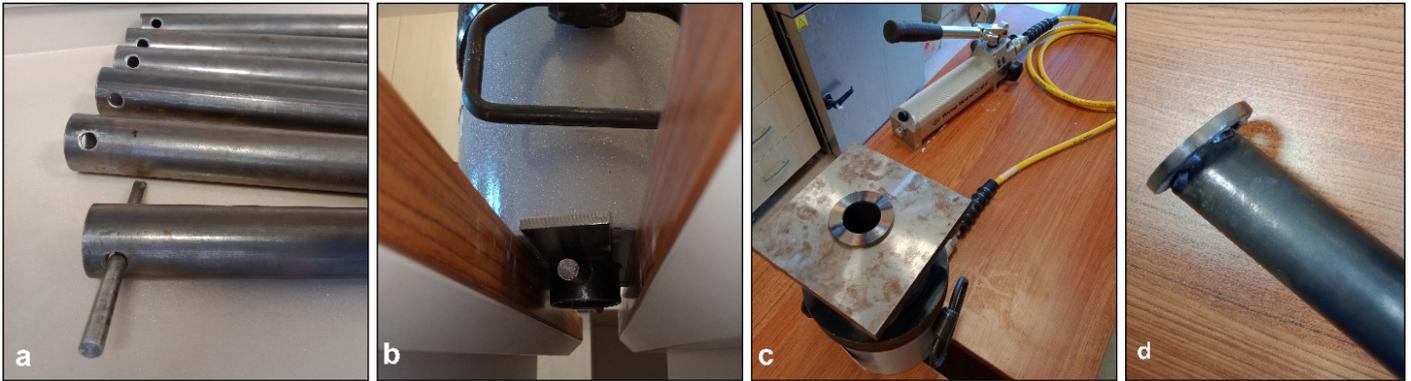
Front part drills of the bolt shanks (a), fixing the shank using rods below the pull-out test equipment (b), top-view of the loading setup (c), failure of welded stabilizer rings (d)
